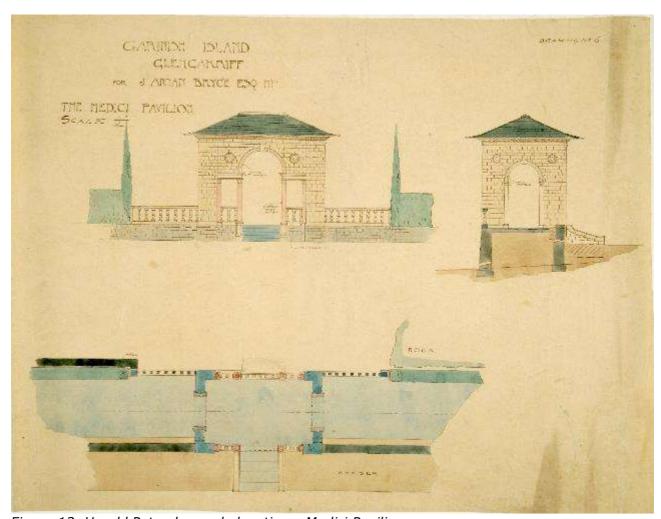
, Harold Peto plan and elevations, Medici Pavilion
